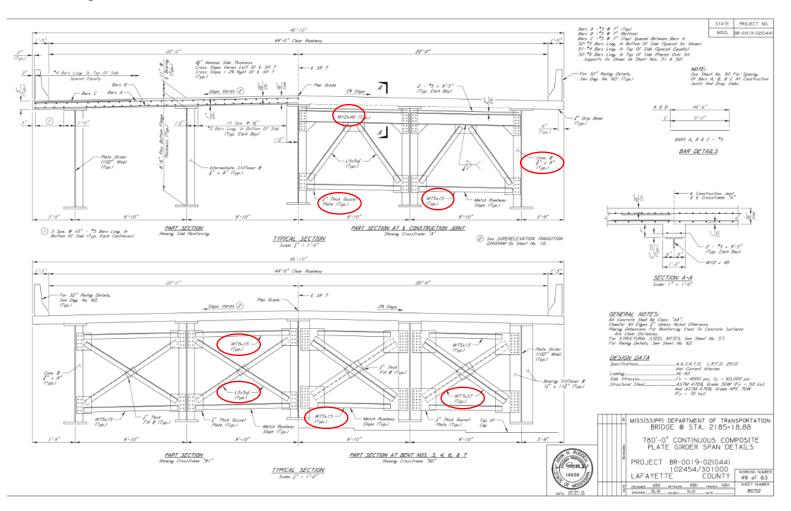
Typical sections of cross frames in the transverse direction of 780 ft girder
